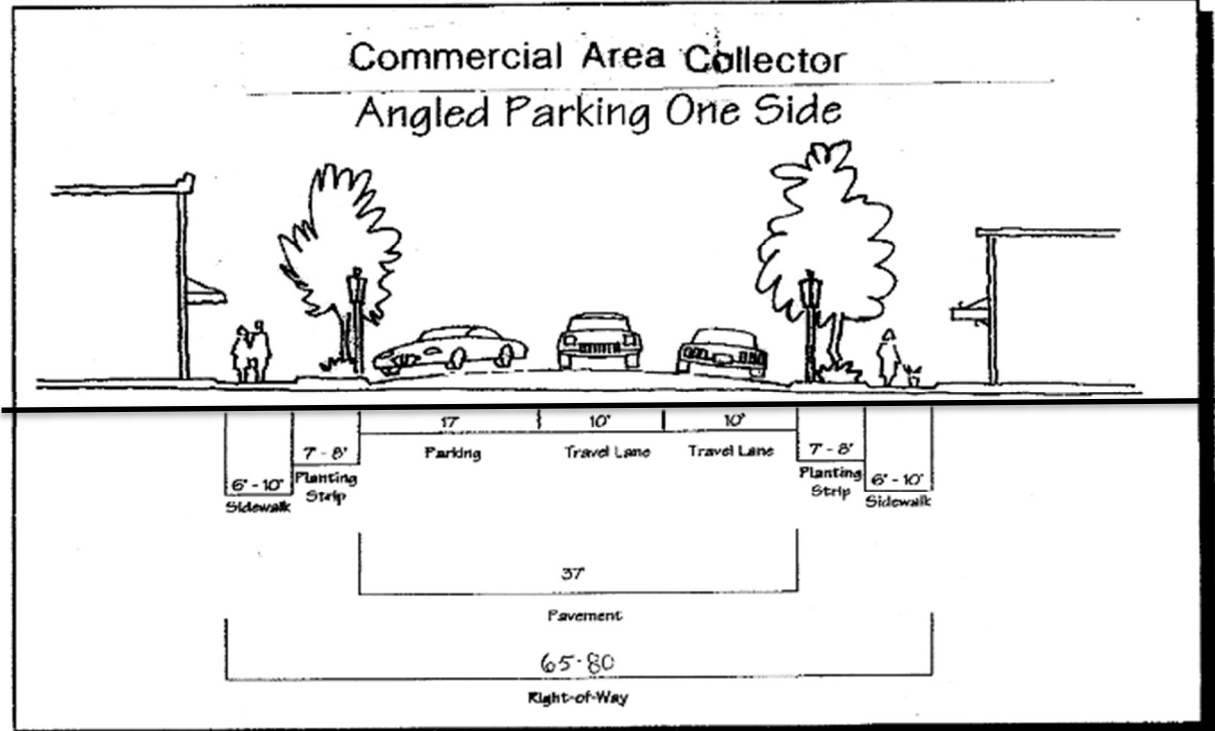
F(3) Commercial/Industrial Collector Street Sections (Parking One Side)
